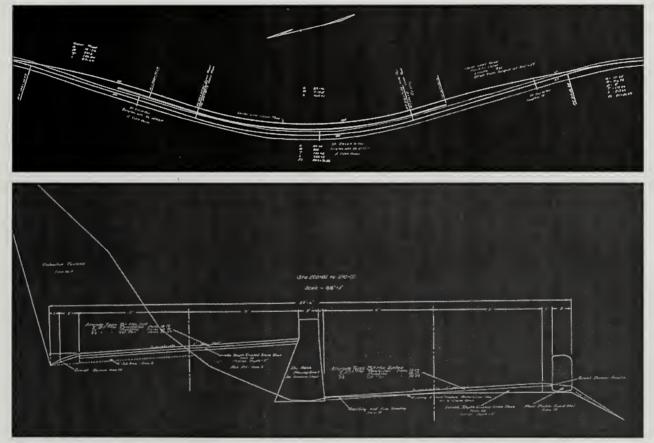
Plan and cross-section of a grade separation feature on Jordan Pond/Eagle Lake Road, near the north end of Jordan Pond, 1935. It is not known if this feature was built. (U.S. Department of Agriculture, Bureau of Public Roads, Project 3A1, 1935)
